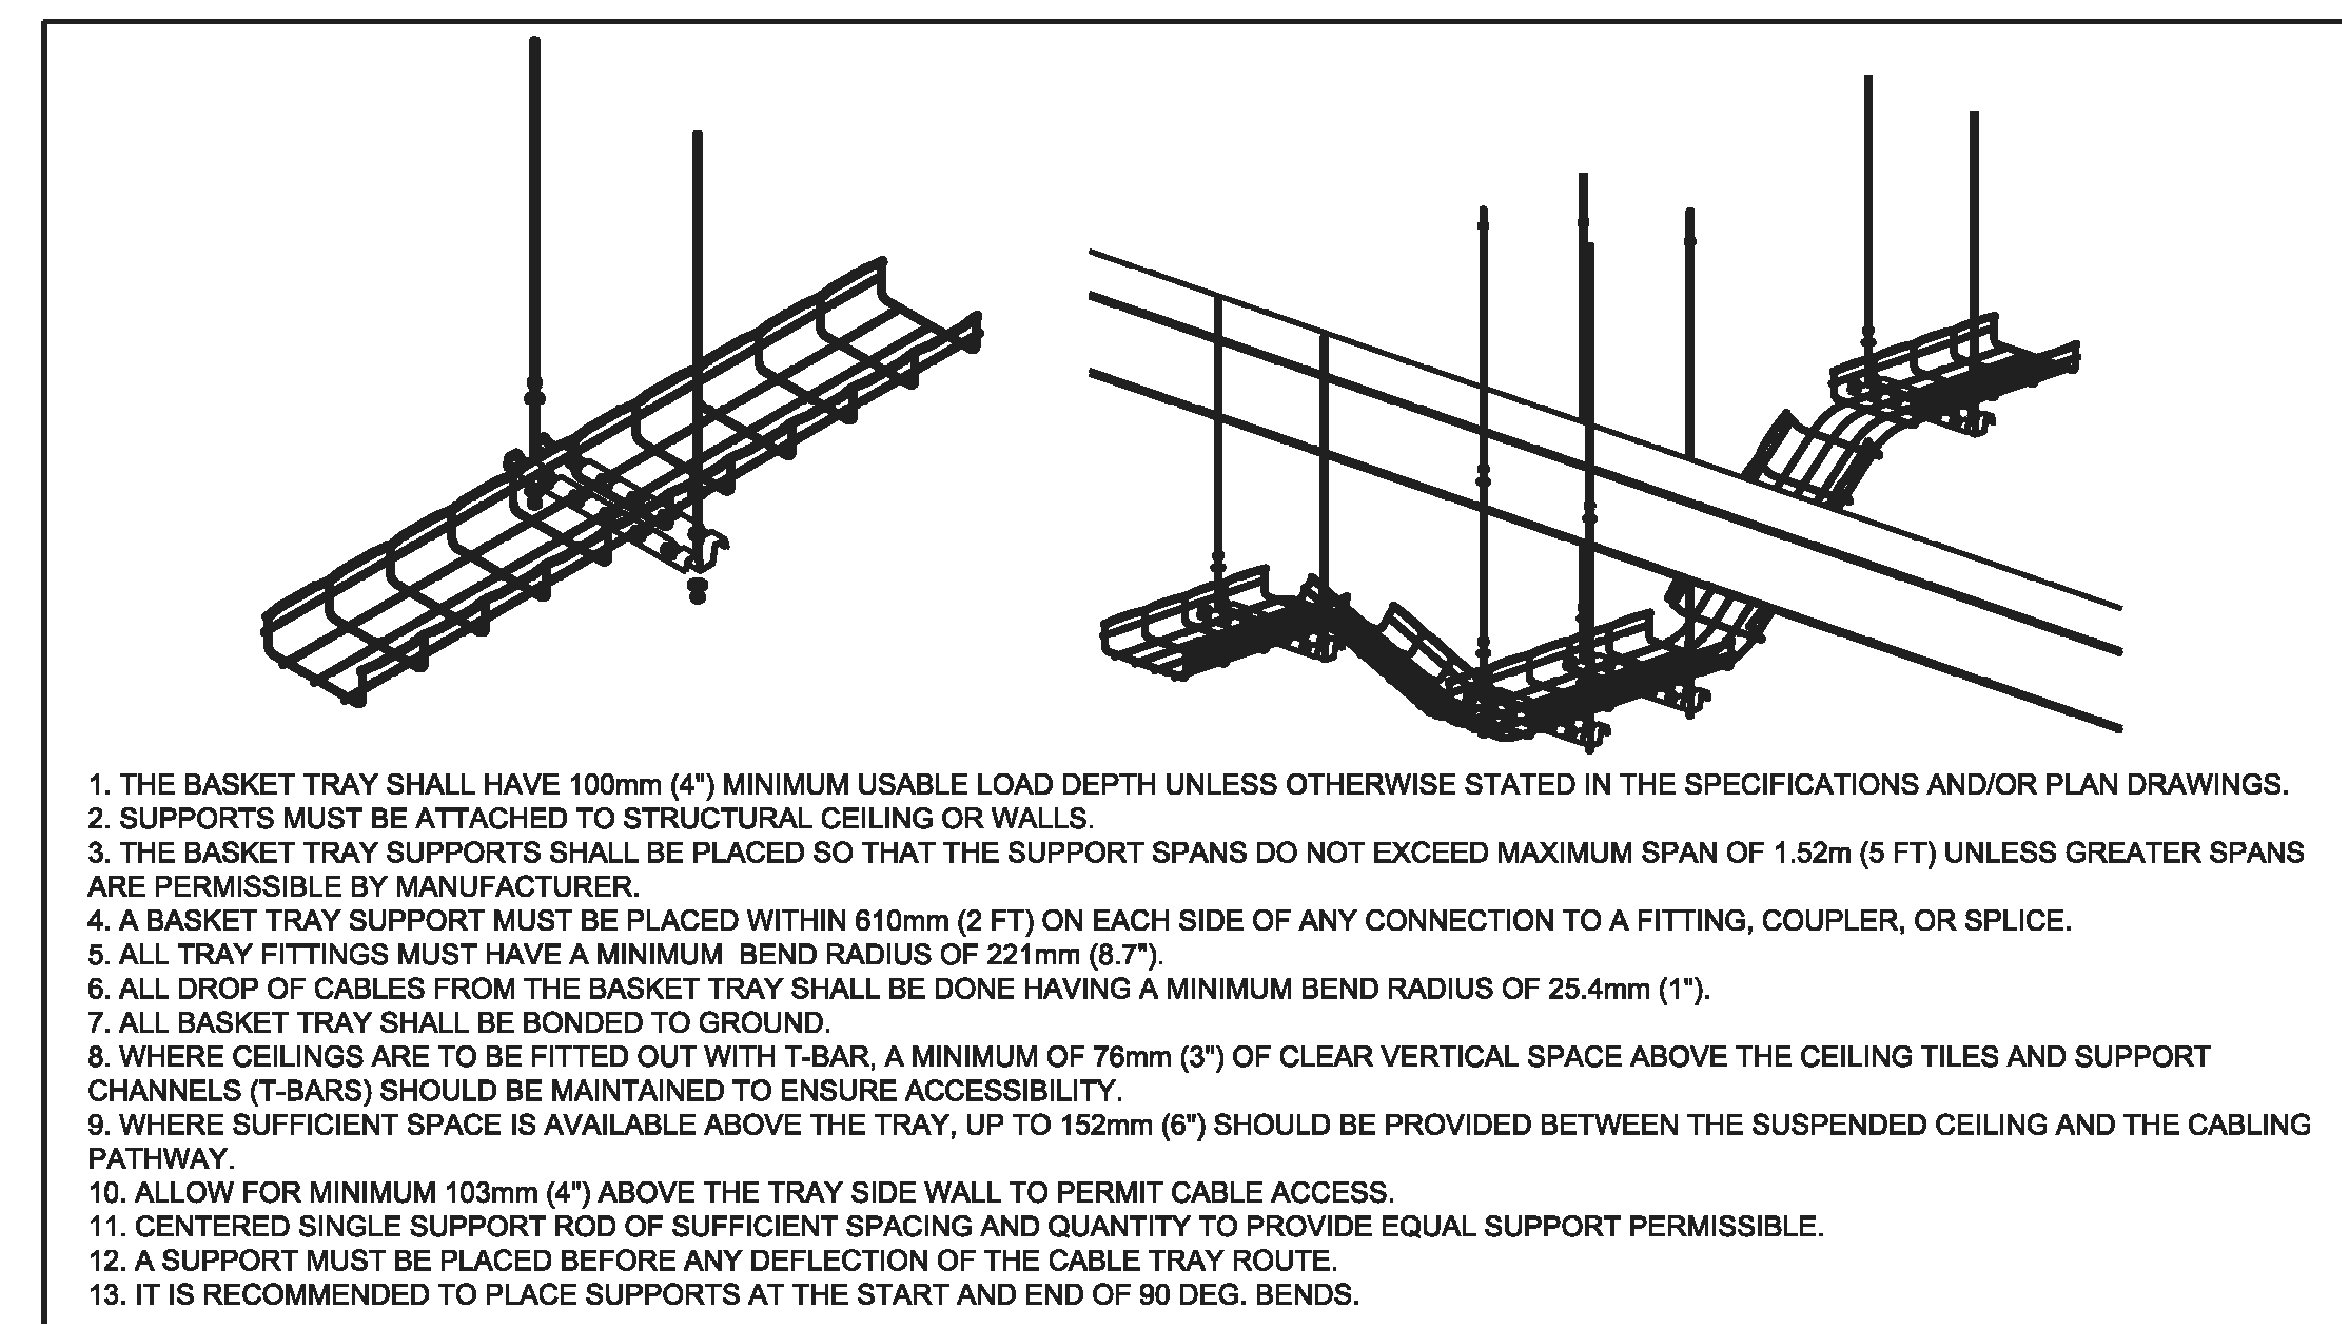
DETAIL OF CABLE TRAY SUPPORT WHEN RUN PERPENDICULAR TO THE JOISTS
